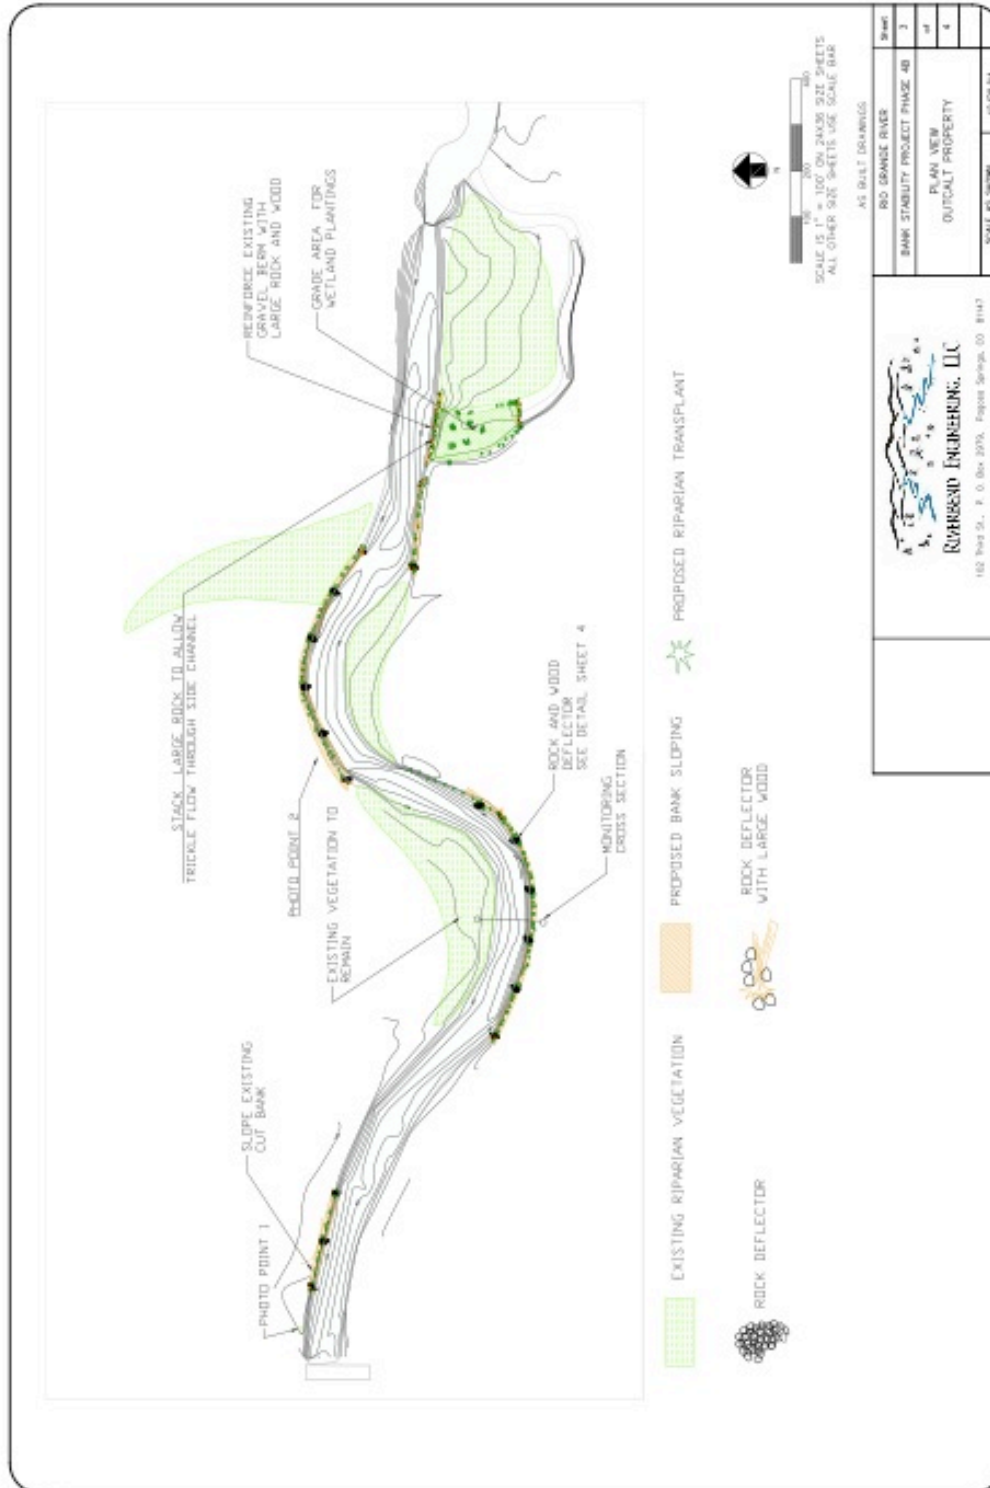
Site 1 Design, Cross Section Location, and Photopoint Locations.
